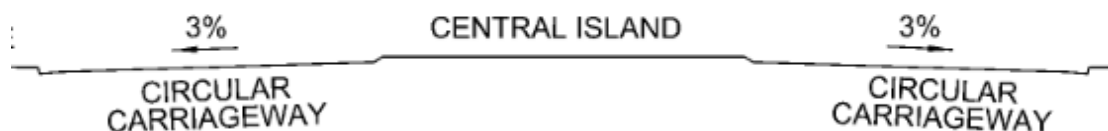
Typical Section of negative crossfall roundabout (Stanton, 2014)
